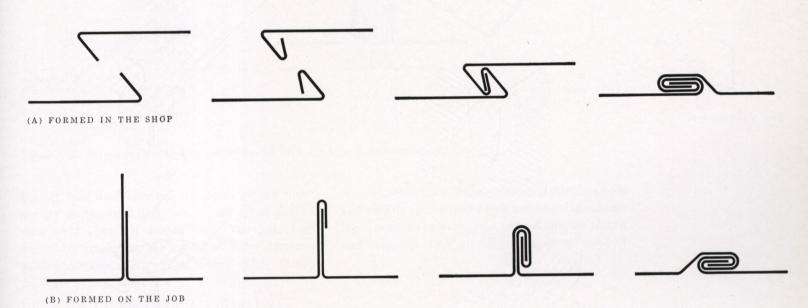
Double lock-seam detail, for use with pan type roofing.
